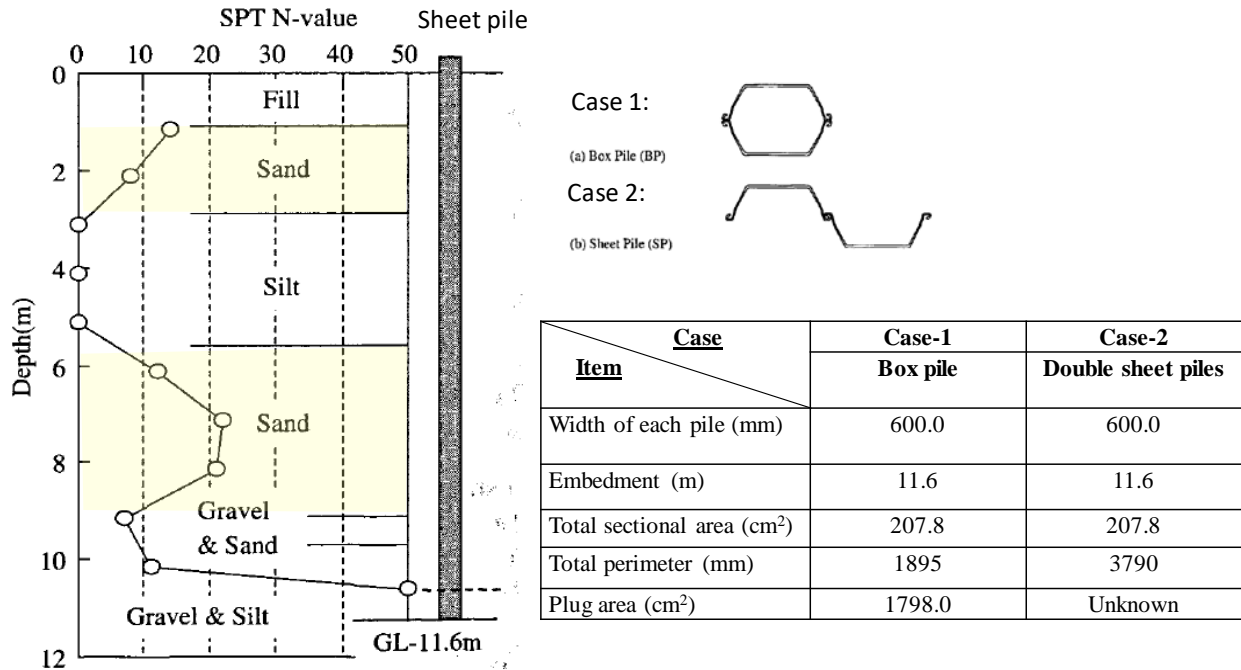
Geotechnical profile and test pile information for axial load test at sand site in Japan (adapted from Taenaka et al. 2006)
